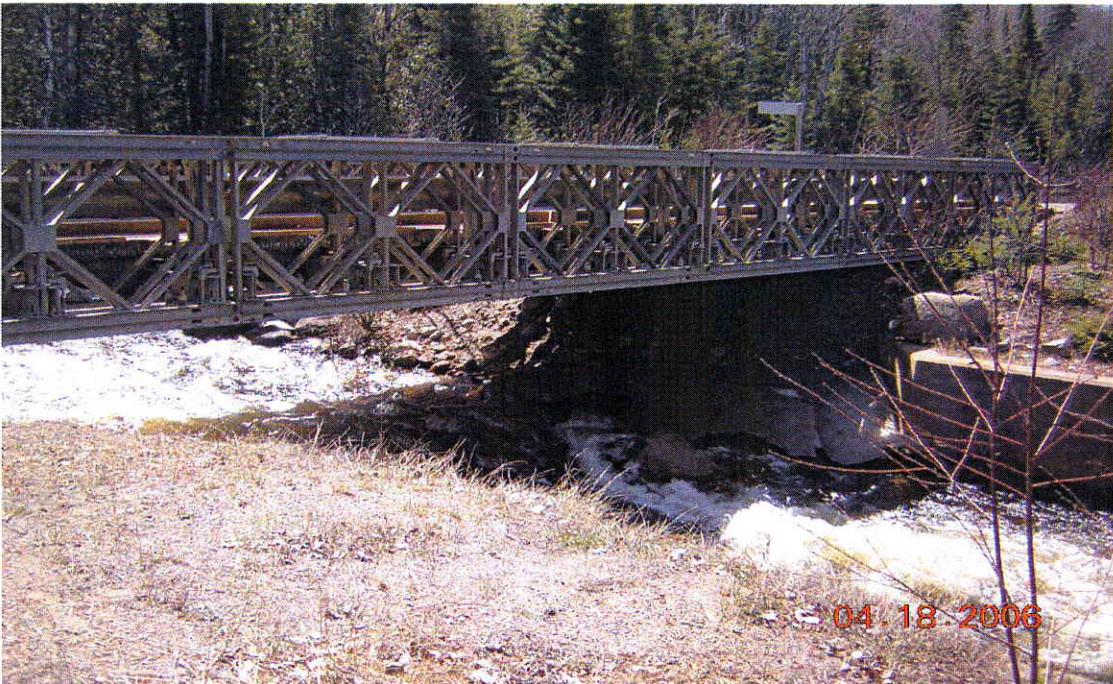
Existing Rapid River Bridge from the northwest. Old south abutment at right.
